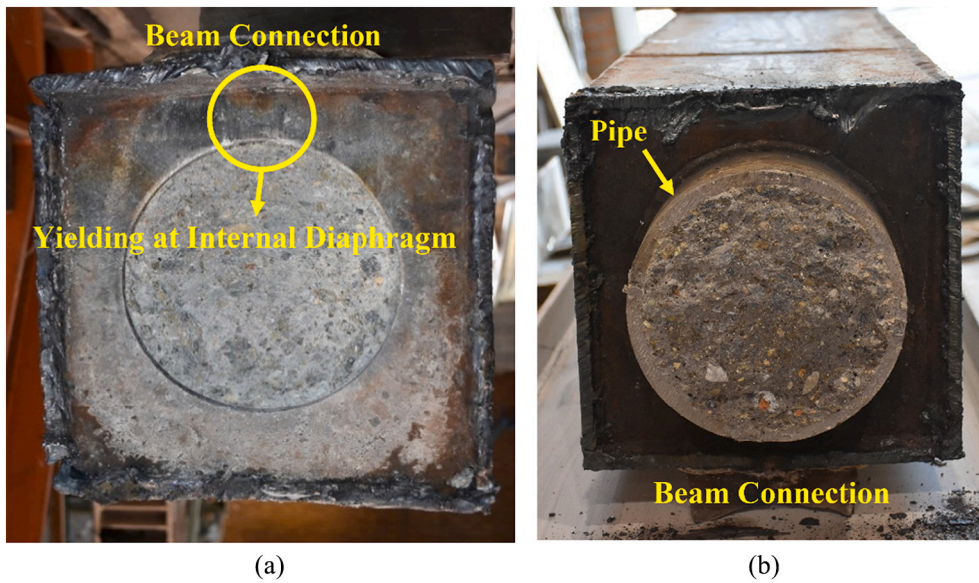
Specimens cut after testing: a) Specimen 1 (ID); b) Specimen 2 (SID).
